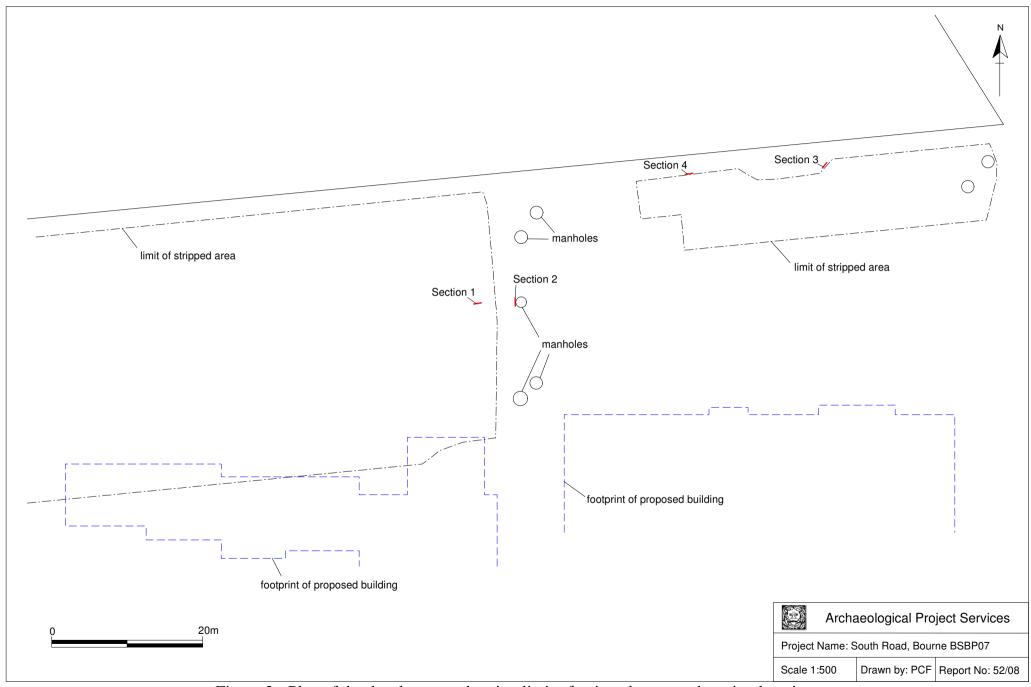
Plan of the development showing limit of stripped areas and section locations
